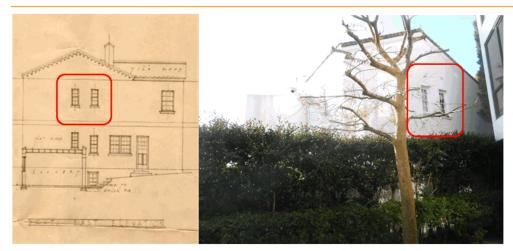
(L) The southern elevation of the 1928 Gilling scheme and (R) the view from neighbouring site in 2015, showing the southern elevation 4+4 windows at first floor level from the 1928 Gilling Scheme still in place.
